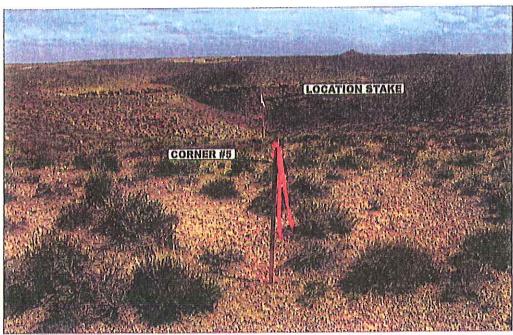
PHOTO: VIEW FROM CORNER #5 TO LOCATION STAKE
